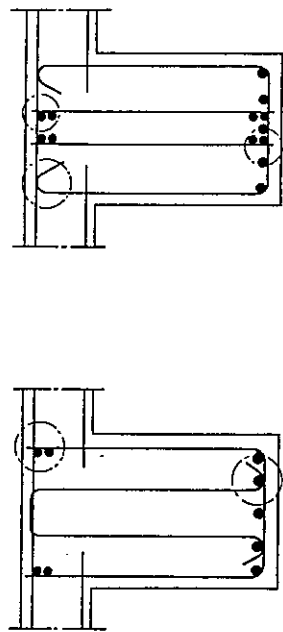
Examples of combination of stirrups and shear assemblies: for detailing of the anchorages in the circled zones, see Fig. 9.1.6
